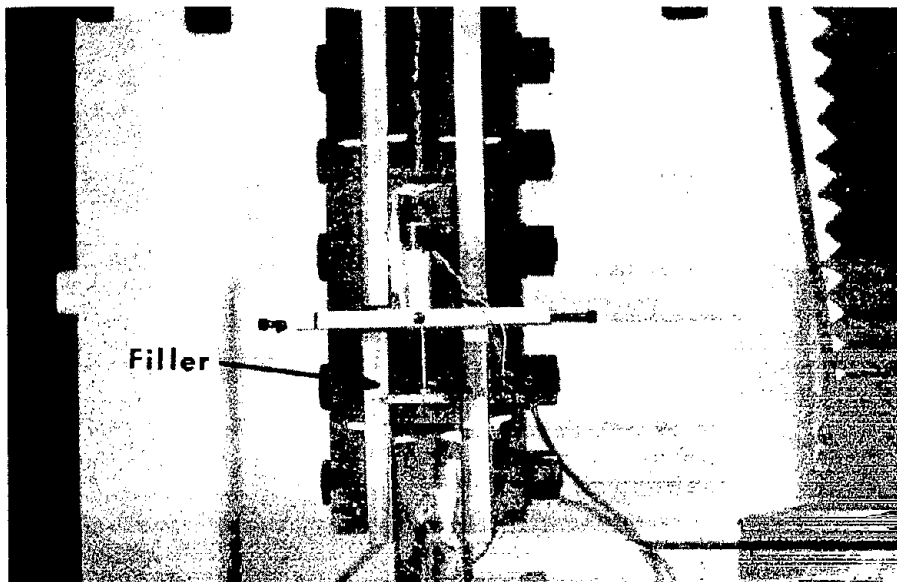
0.75 in. (19mm) fillers--intermediate load
